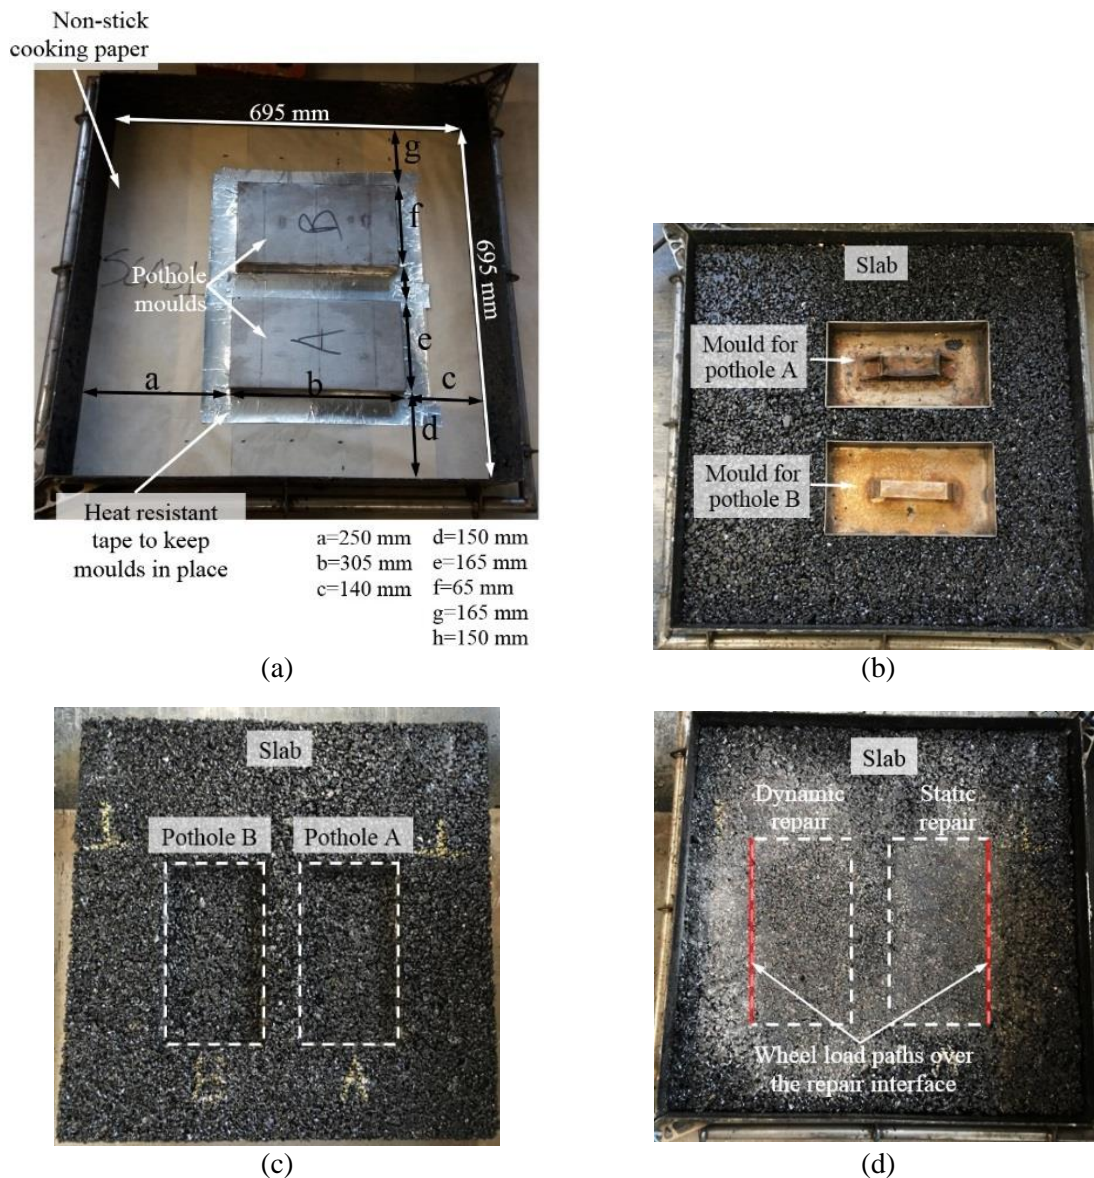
Slabs for wheel tracking tests: (a) moulds; (b) constructed slab with pothole moulds; (c) demoulded slab; (d) repaired slab and demonstration of wheel load path at the repair interface
